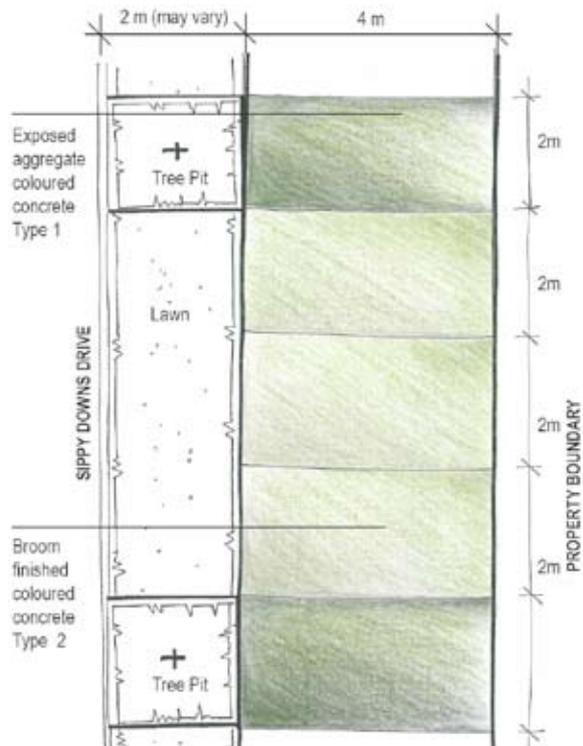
(a) – Footpath Paving – Town Centre Connector (Sippy Downs Drive and Power Road)
